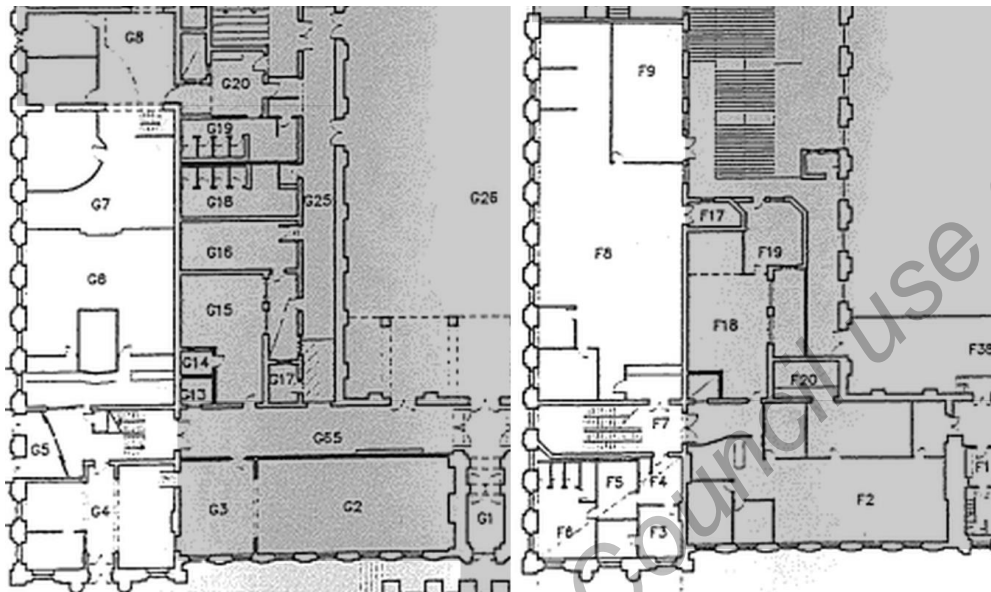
West wing plan arrangement (Ground floor – left; First floor – right).
